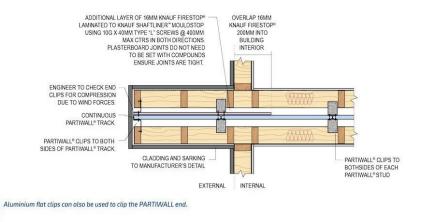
OUTRWALL Horizontal Transition - Any Cladding
